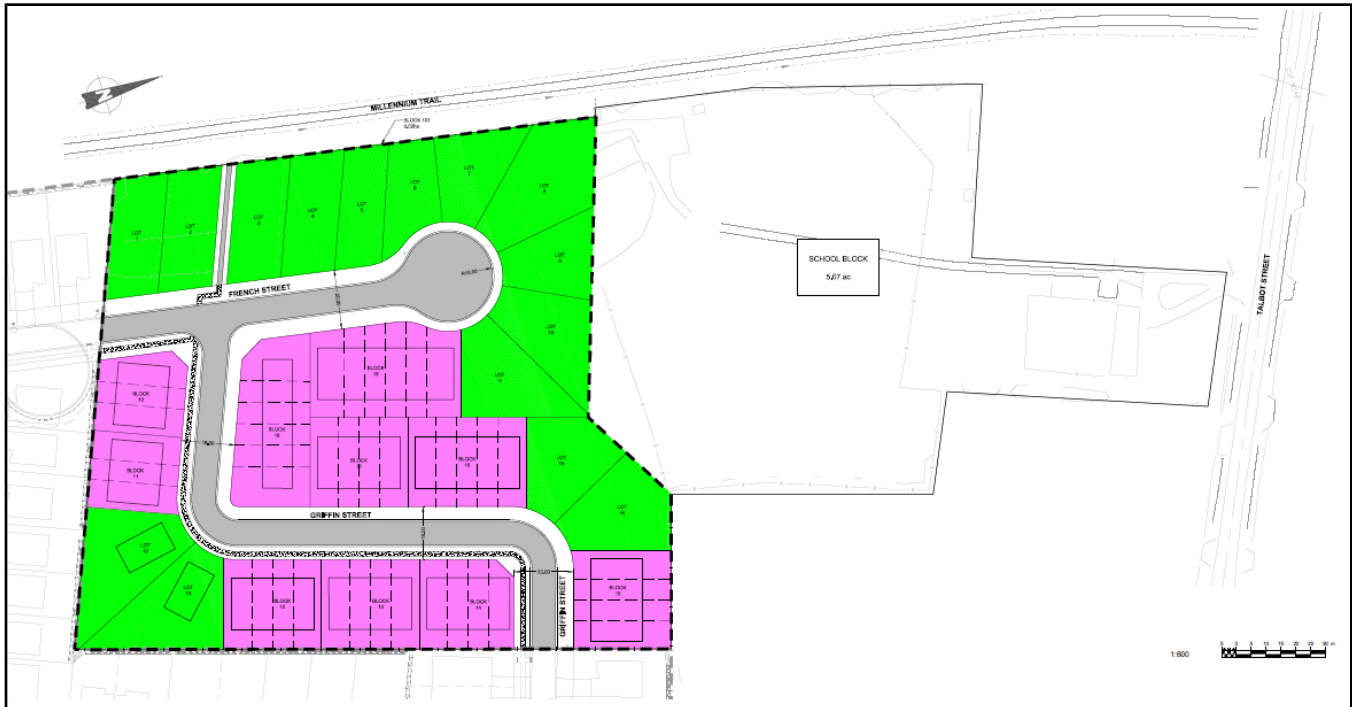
Concept Plan (Single detached lots shown in green, townhouse blocks shown in purple, the road network and open space block shown in grey, and the school block is outlined in white) (Source: Ainley Group)
